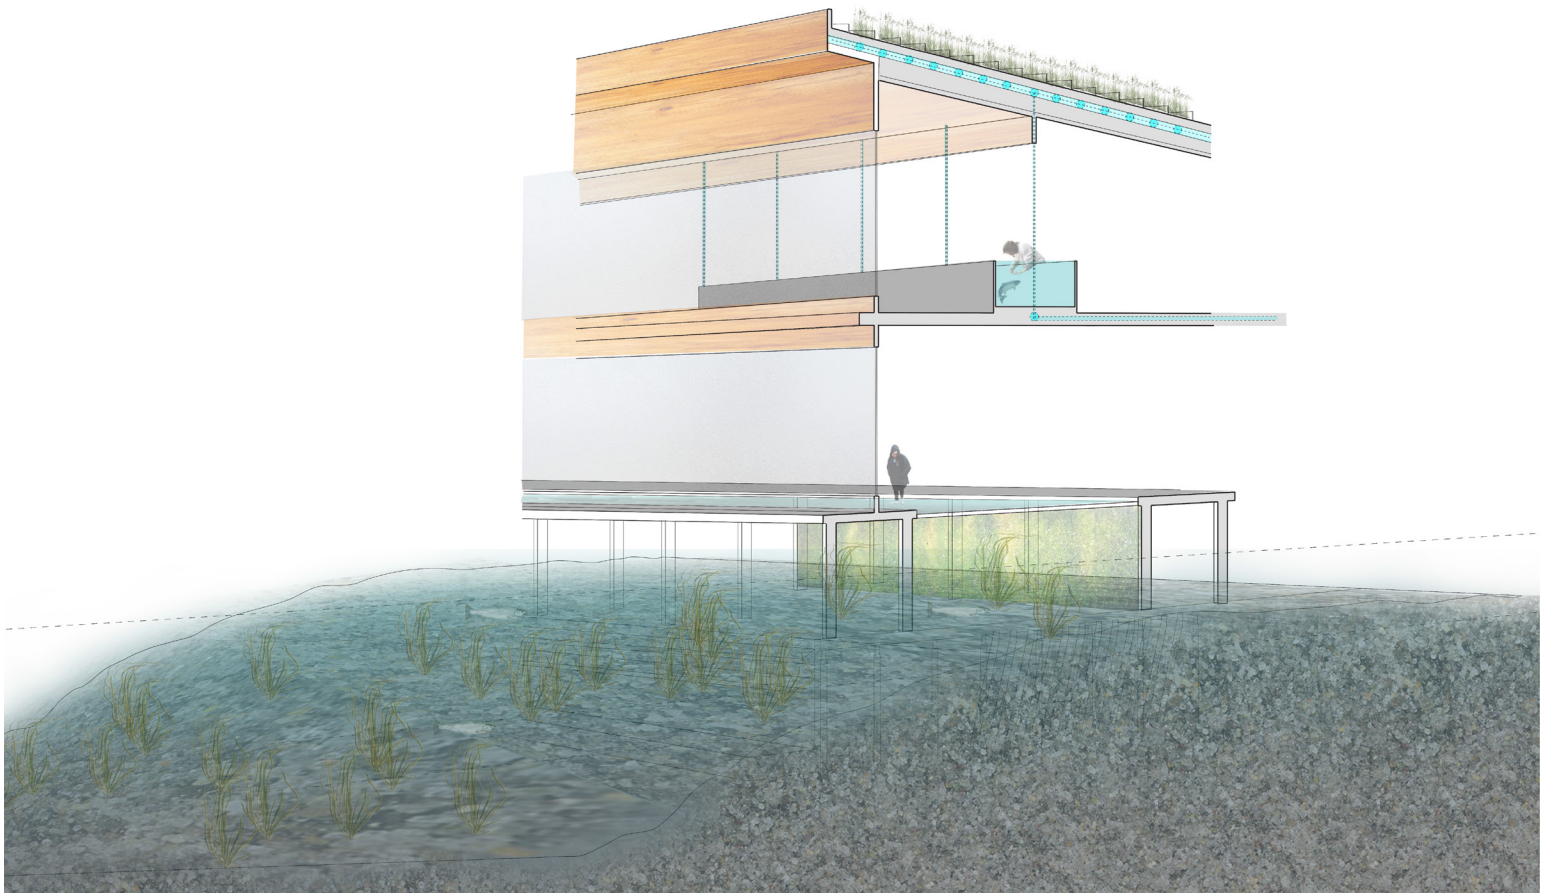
Partial Cross Section of the Salt Water Building showing water movement below the building.
